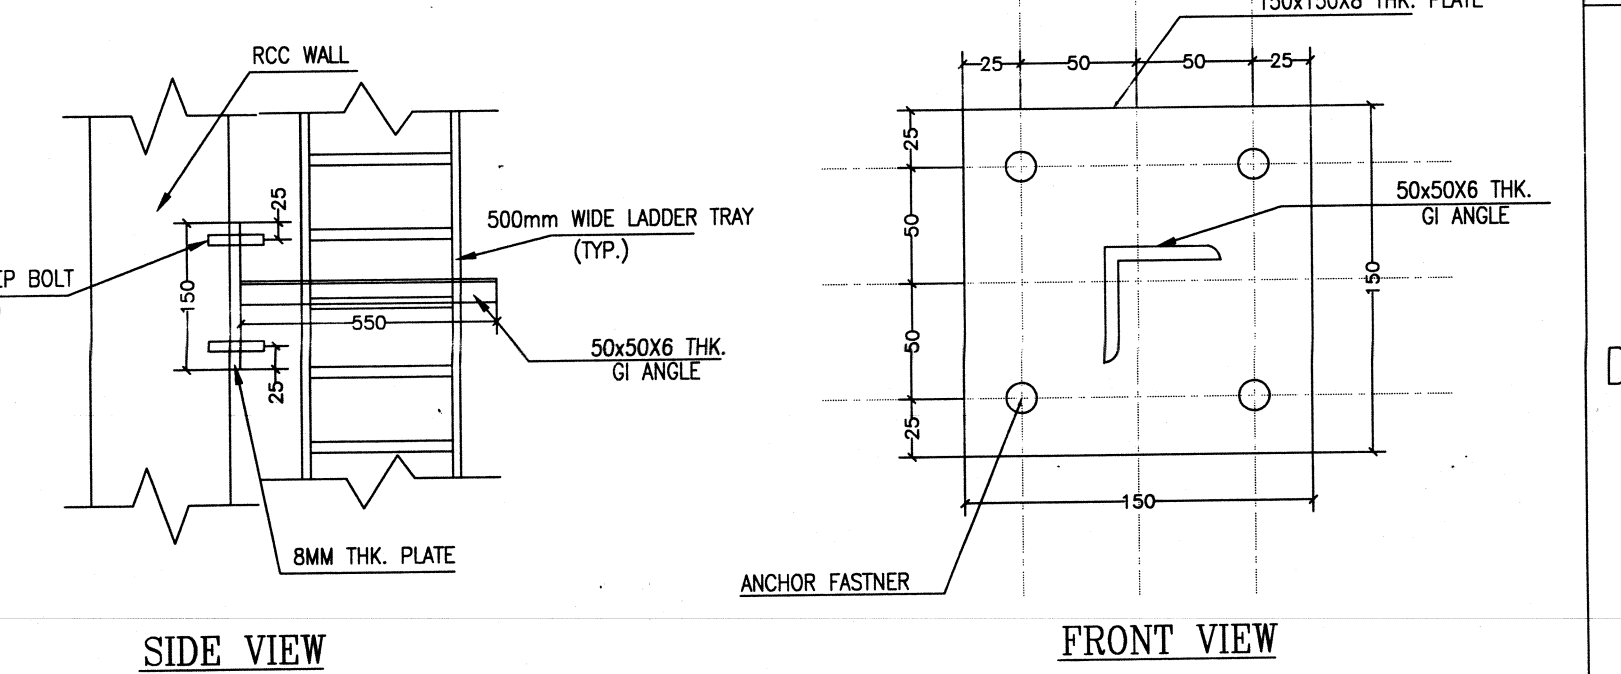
DETAILS OF 'C' CABLES ARRANGEMENT ON WALL
